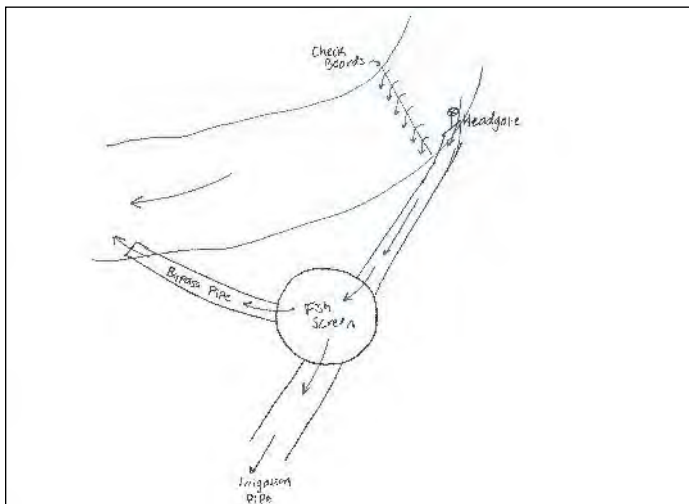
PLAN VIEW OF NEW IRRIGATION DIVERSION SYSTEM FOR NORTH FORK HORSE CREEK.
